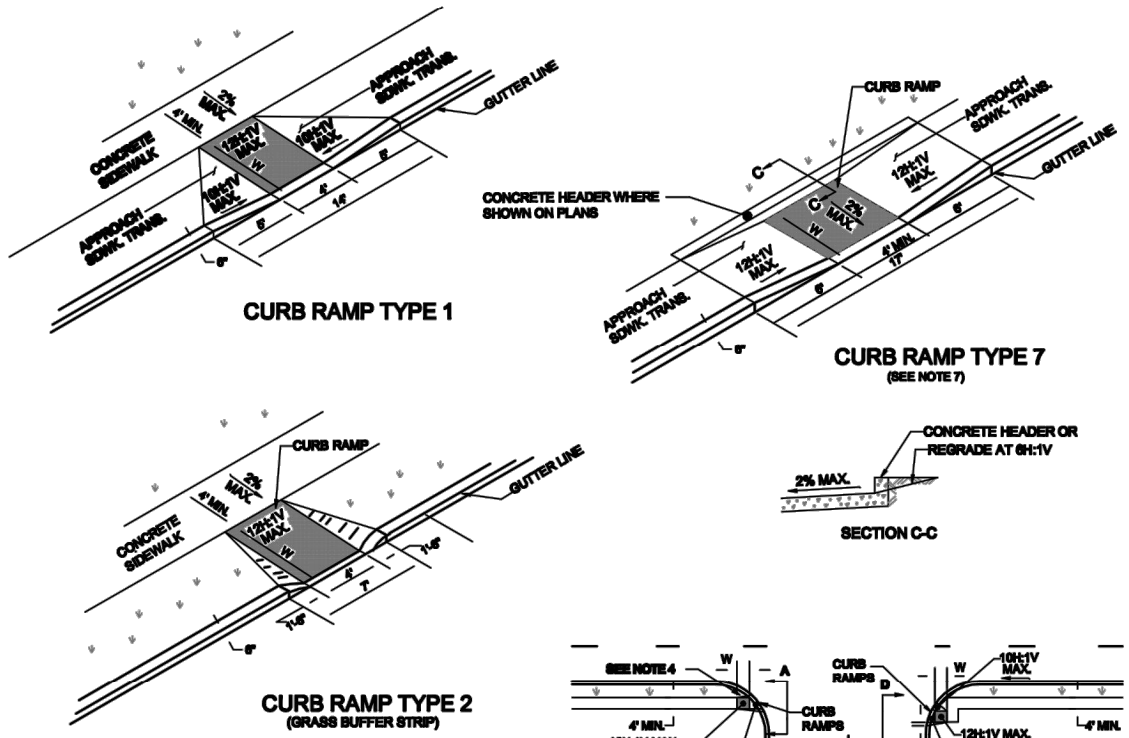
MORRIS COUNTY TYPICAL DETAIL CONCRETE SIDEWALK NOT TO SCALE 9-1-08 DD
